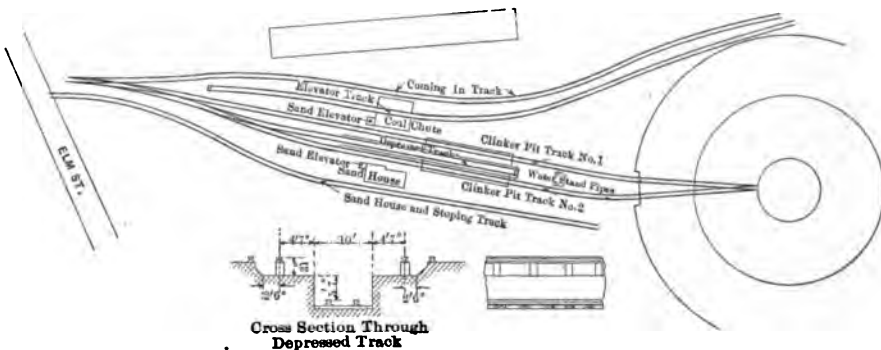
Typical engine-house lay-out, Jackson Junction, Mich.—Michigan Central.
